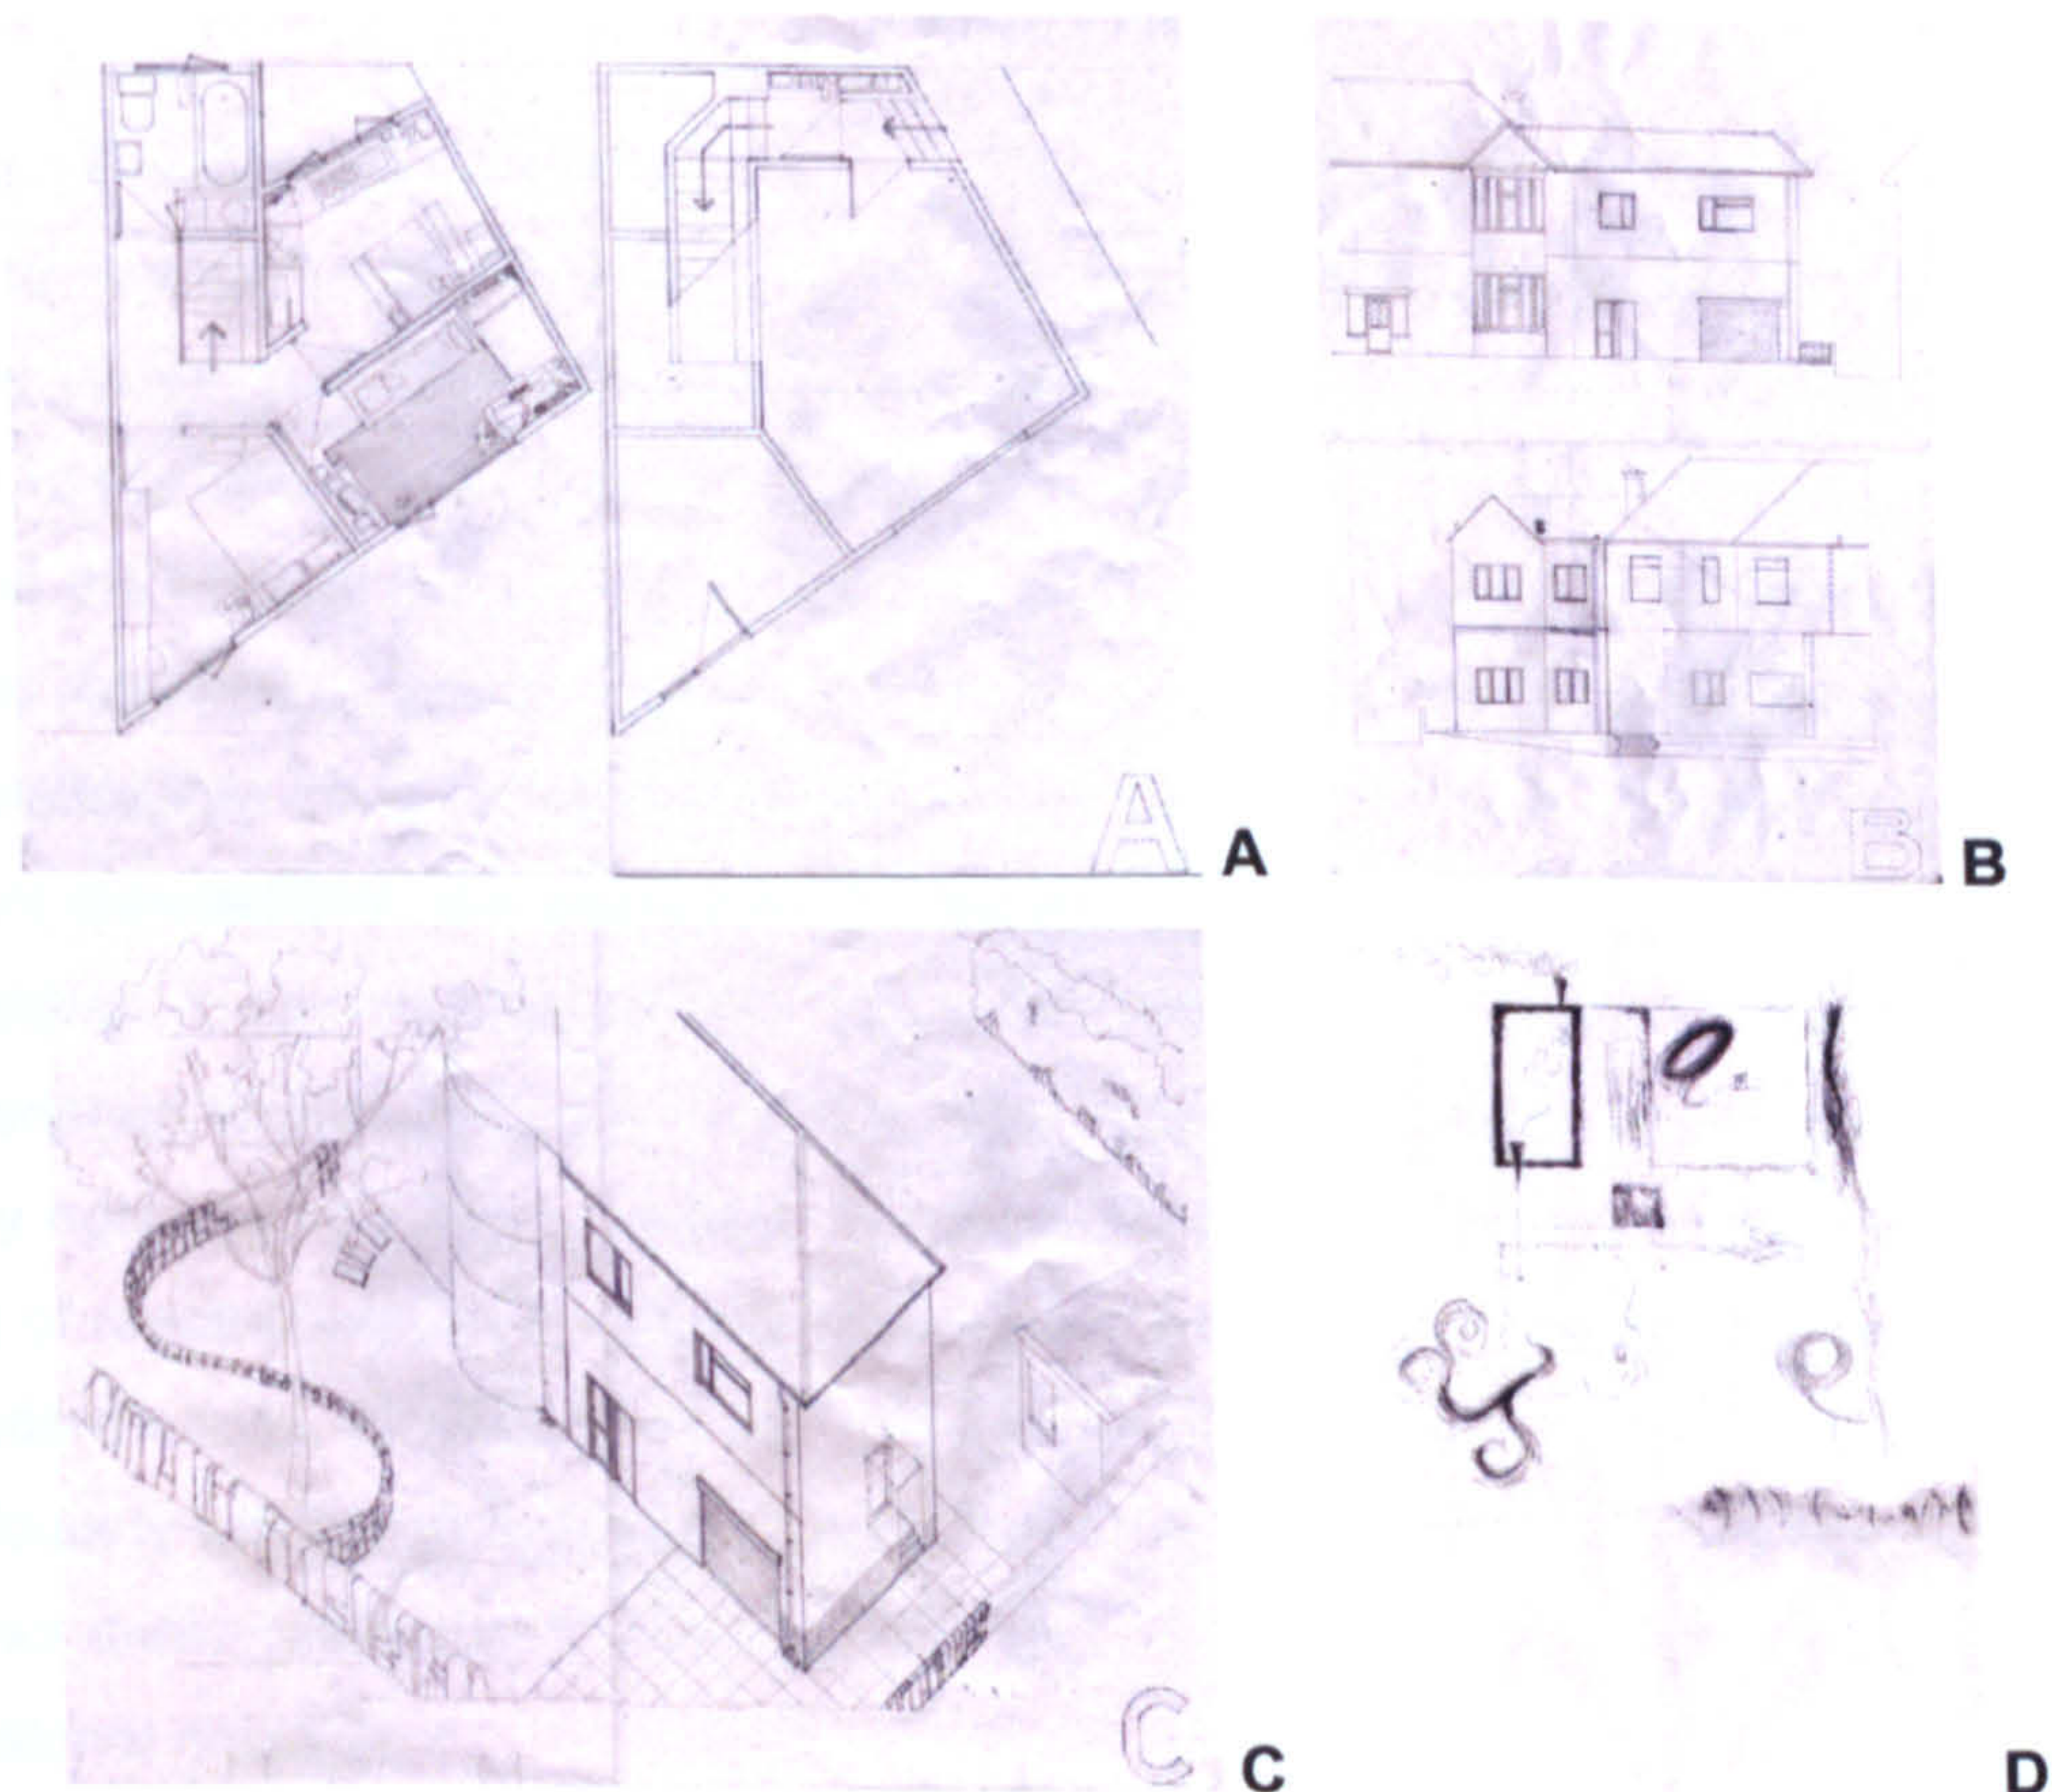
Four drawings which were used within the first pilot study – A: Ground and first floor plans, B: East and West elevations, C: Isometric drawing, and D: Abstract drawing which represented the floor plan.
